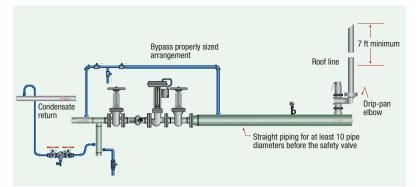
Safety valves can be installed downstream of a pressure-reducing valve, as shown in this illustration
